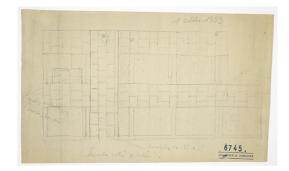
Examination of the Southwest Facade (1 October 1953)⁴⁴
